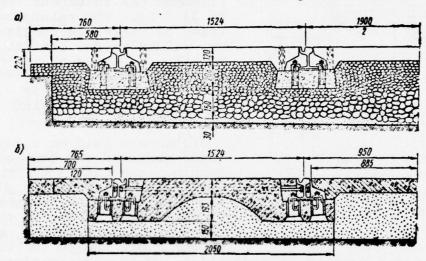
Road constructions on combined foundations: a--slab-footing type; b--block type
